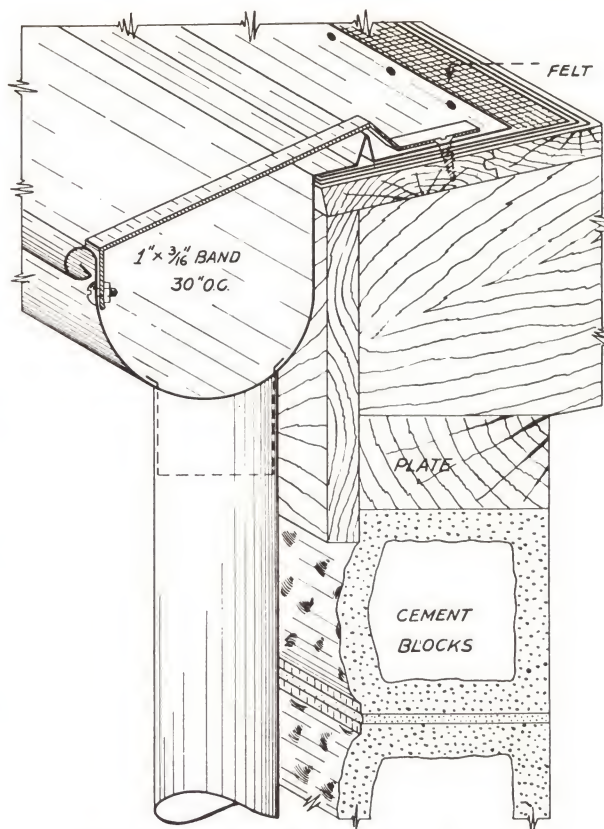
HANGING GUTTER FOR GRAVEL, SLAG AND FLAT TILE ROOF INSTALLATION SCALE 2"=1'-0"
